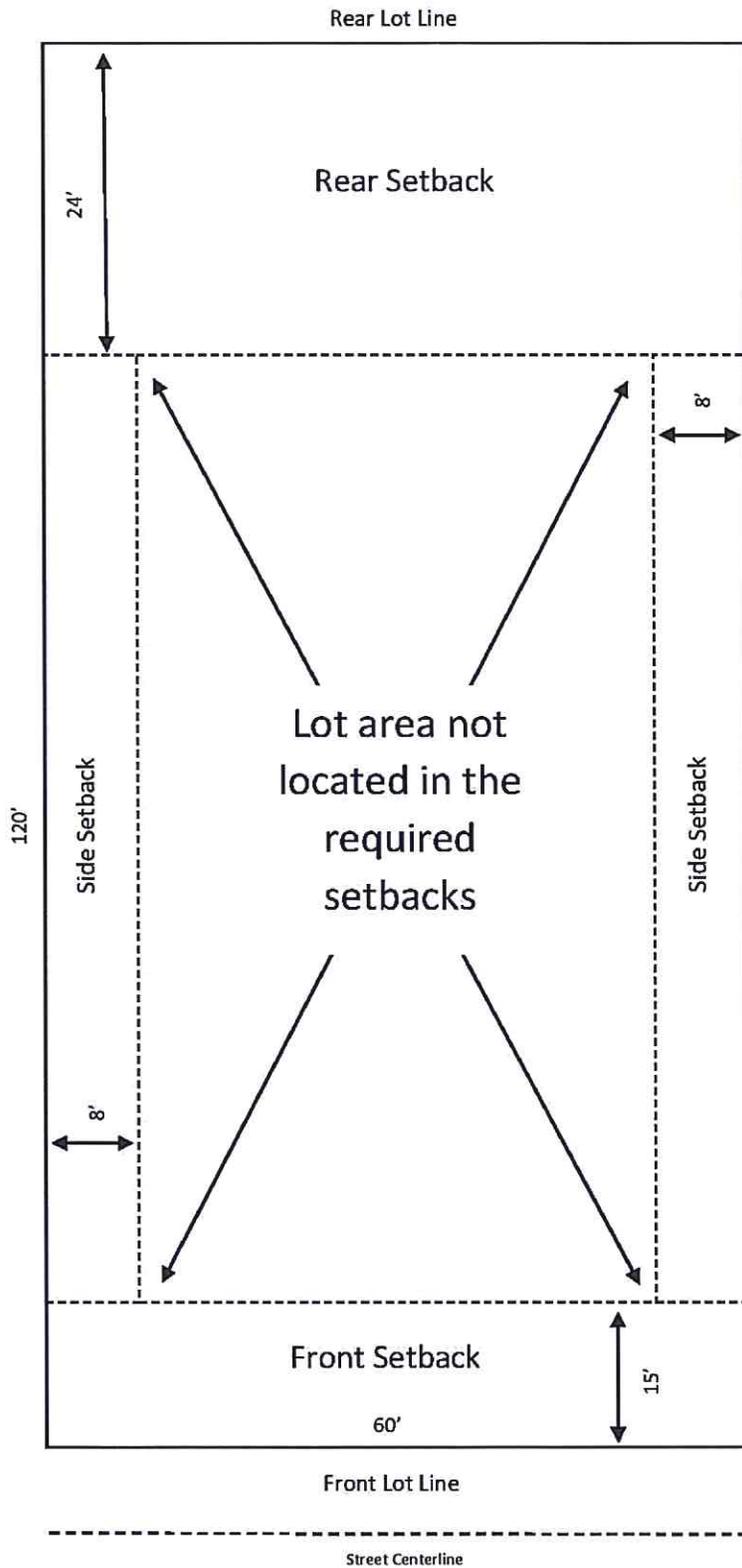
Setbacks (Example using R-1 zone setbacks)
